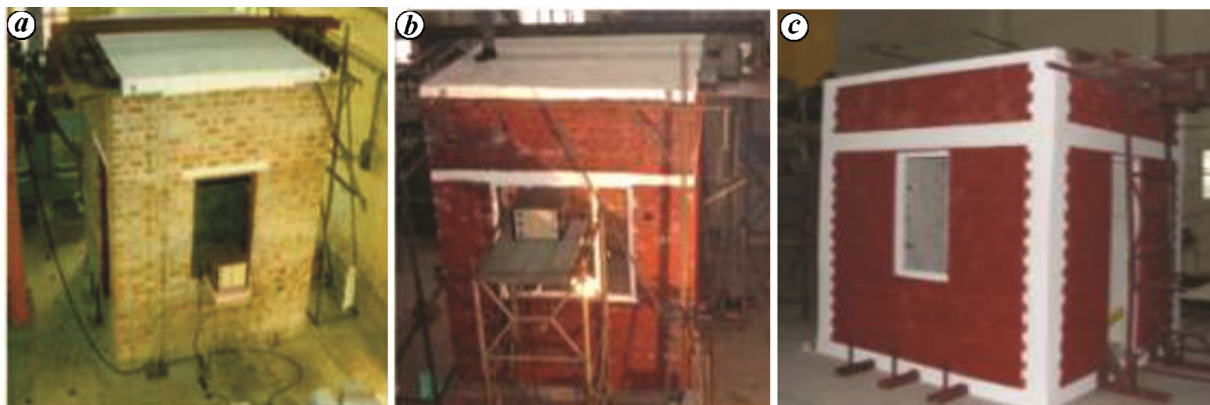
View of (a) URM; (b) RM; and (c) CM building.
